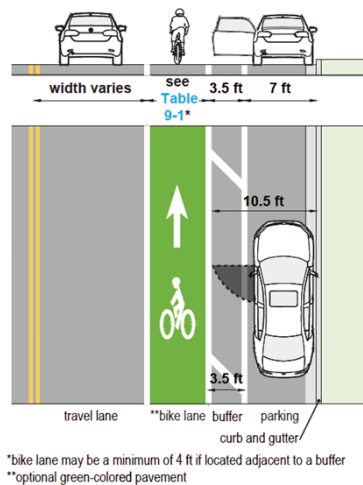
Bike Lane with a Door Zone Buffer adjacent to Parking
